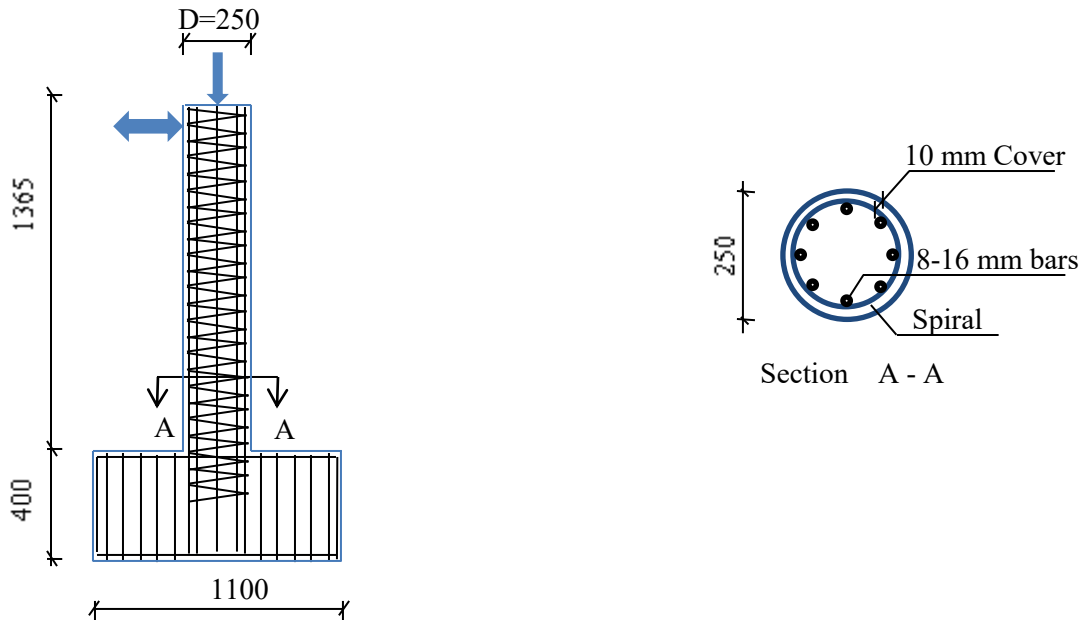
High strength circular concrete columns details (Saatcioglu and Baingo 1999)
